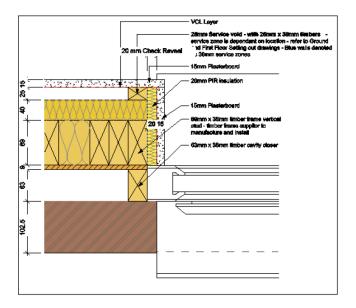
E4 (drawing 20-AC-04) unfilled cavity- materials legend
